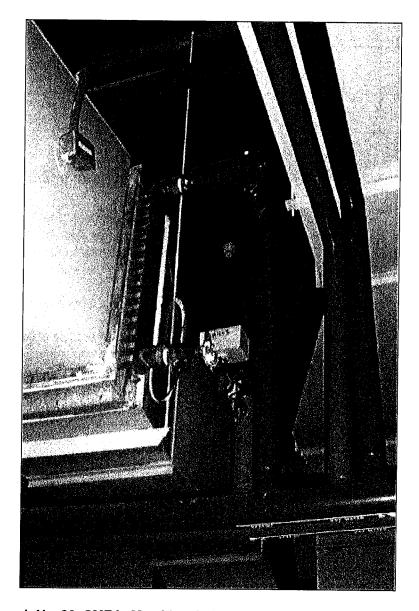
SMF Hard Fibreglass Casing to Cooling Towers on Roof
